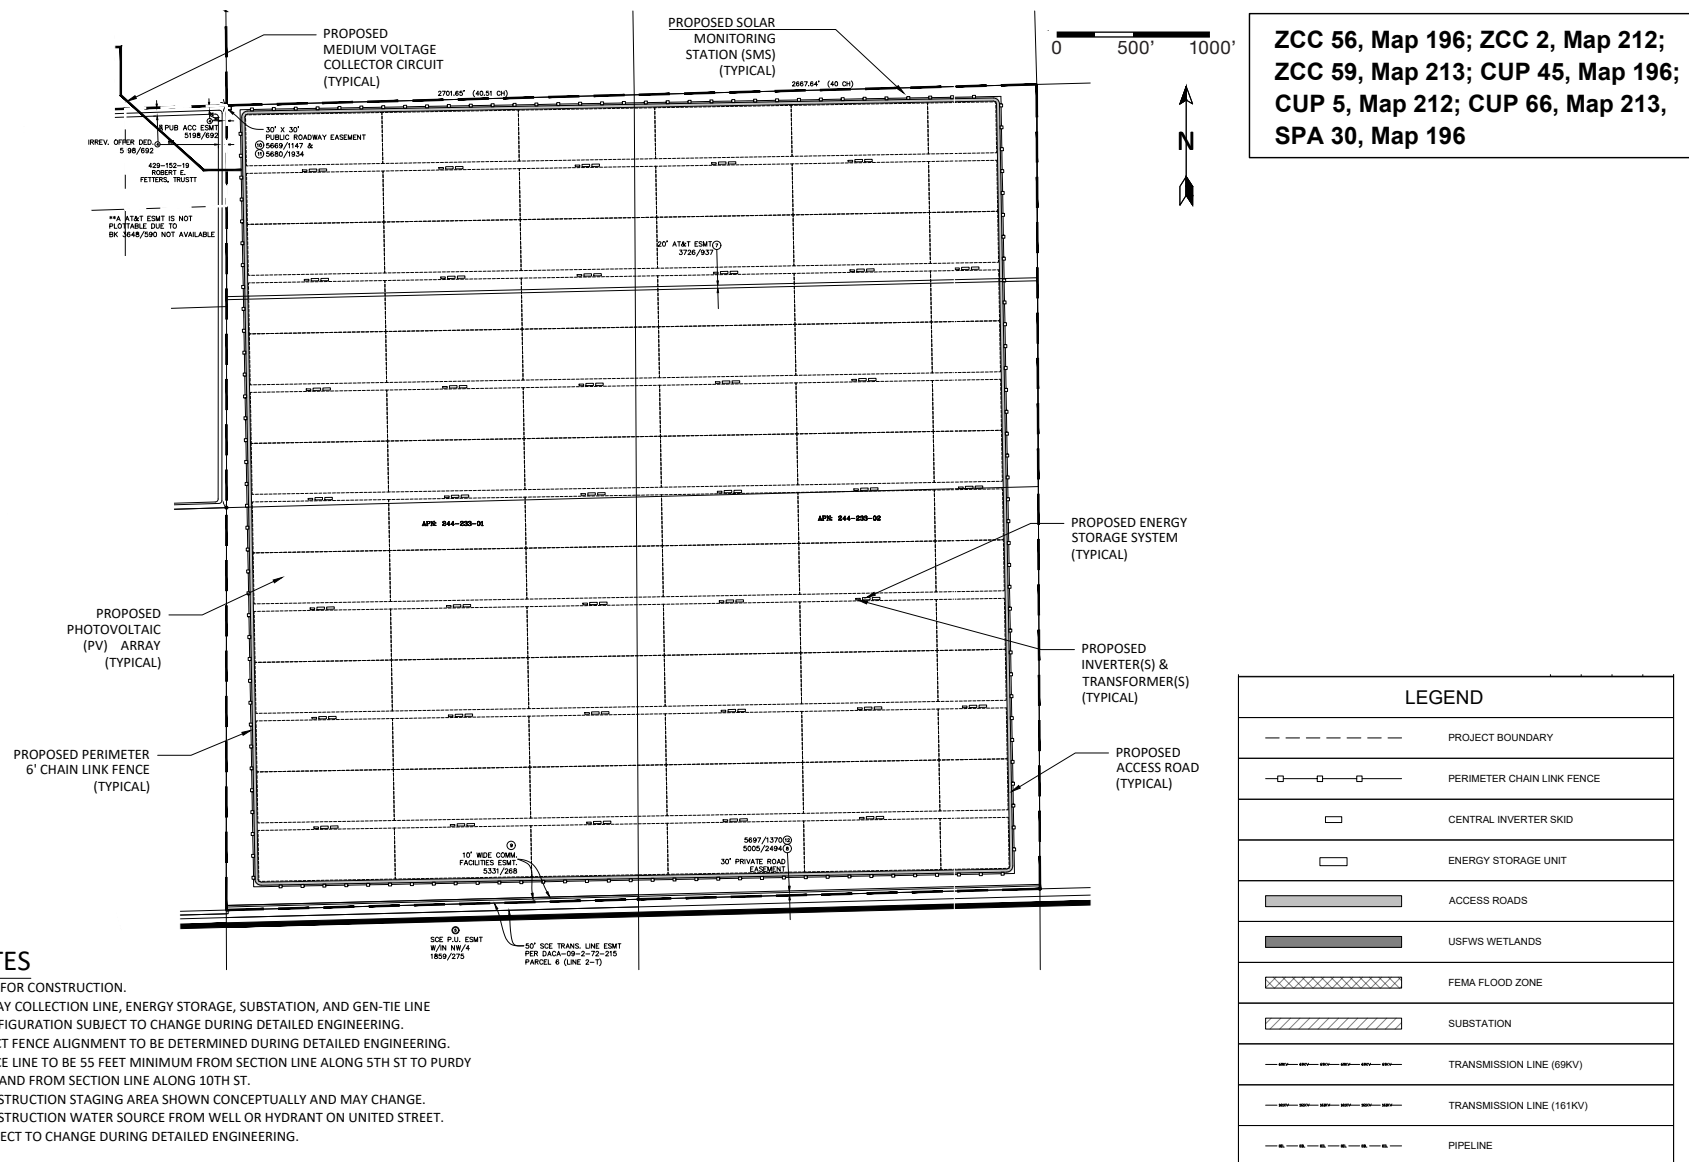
B: SOUTHERN SITE PLANS - PART 2
